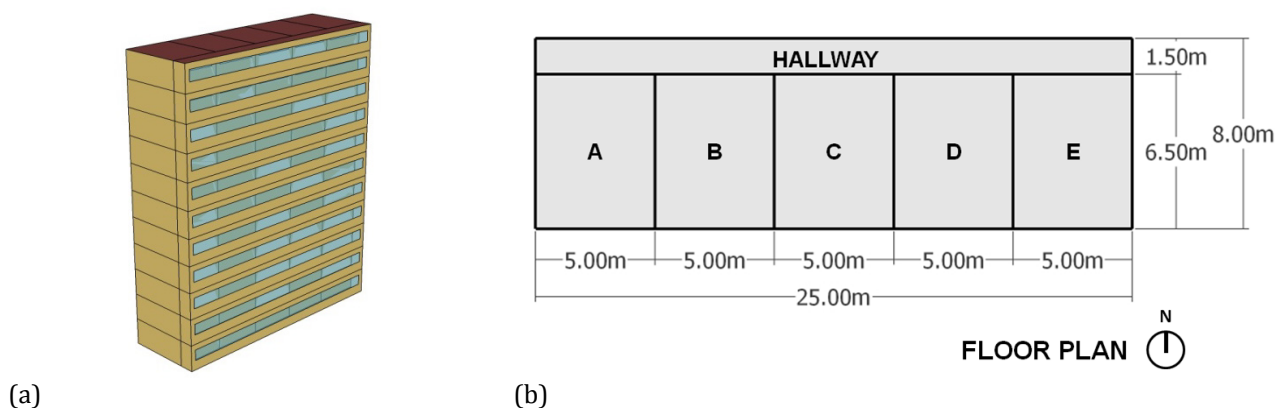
Perspective view (a) and floor plan (b) of representative office building.
